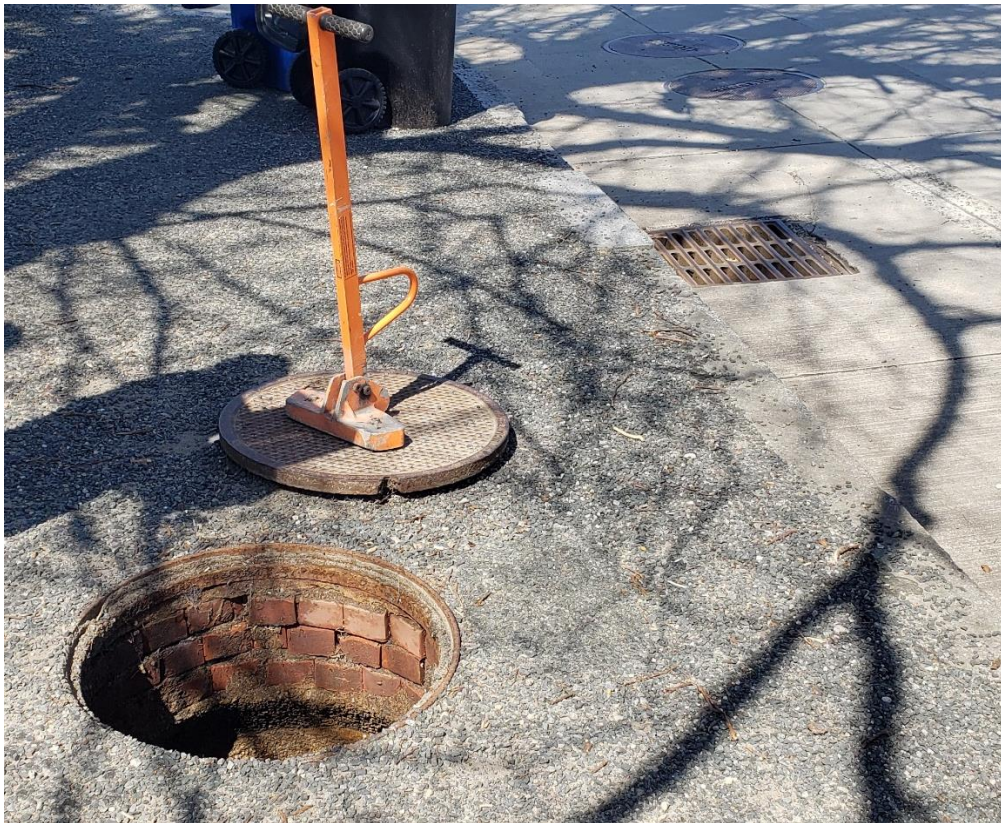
Existing Condition of Sanitary Manhole and Catch Basin on Bellevue Ave, SMH-194-42 and CB-194-155
